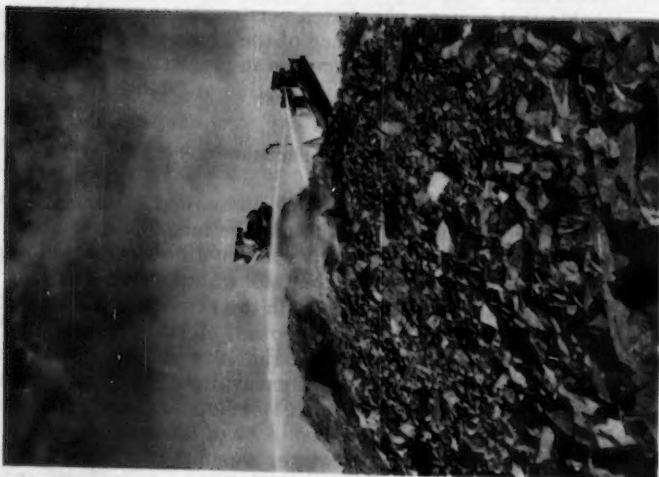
TYPICAL ROCKFILL - SLUICING - WISHON DAM
